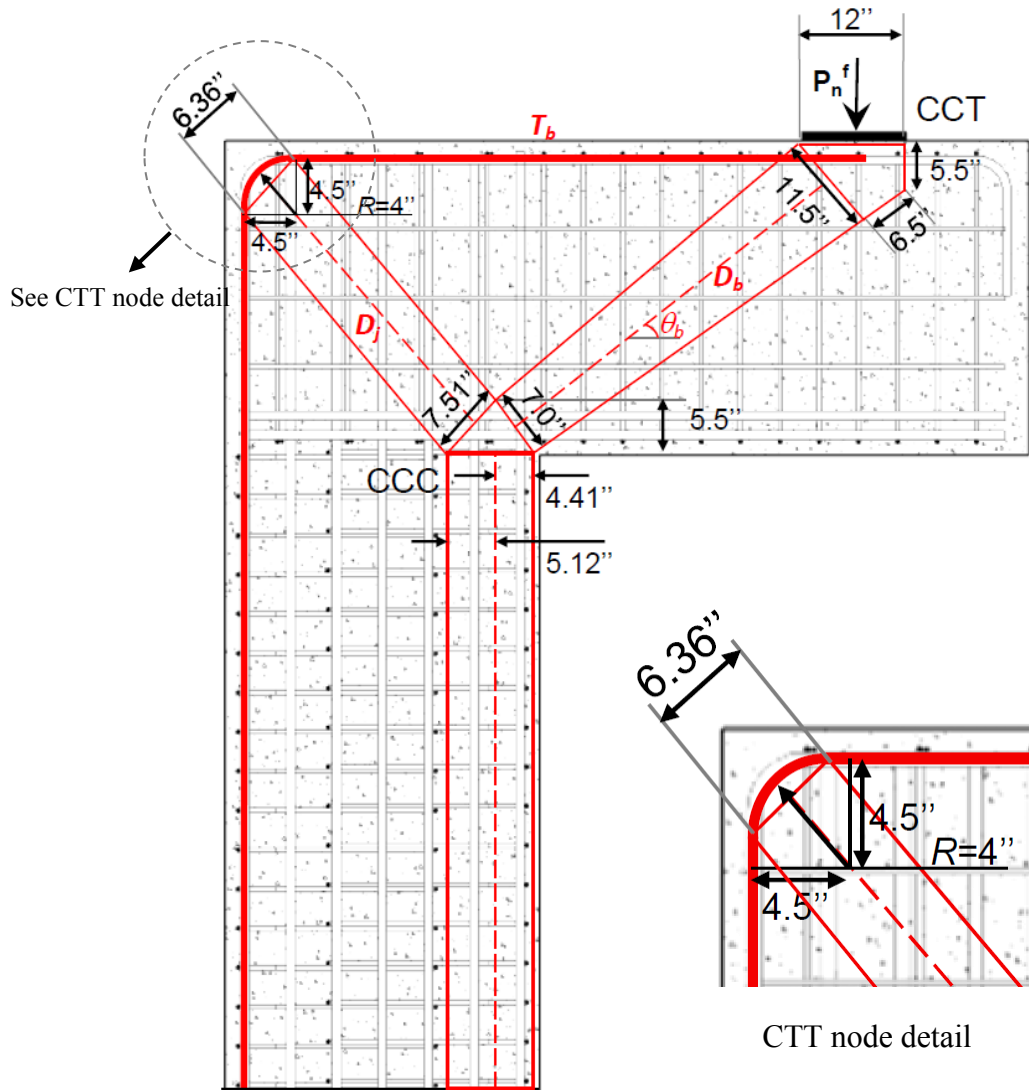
Strut-and-Tie Model for C-Beam Specimen 1.
